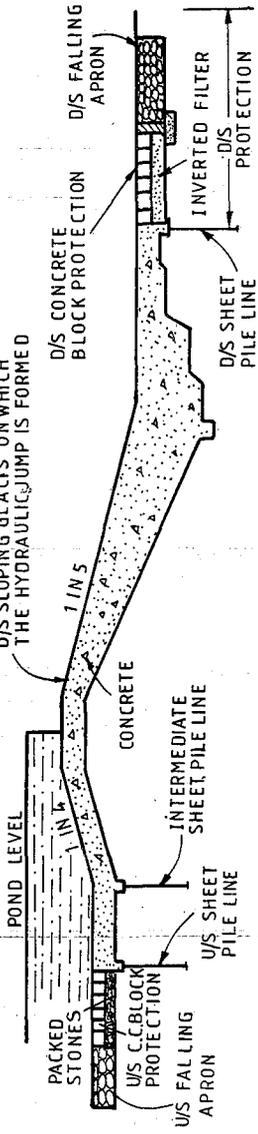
A typical cross-section of a modern concrete weir founded on permeable foundations.
